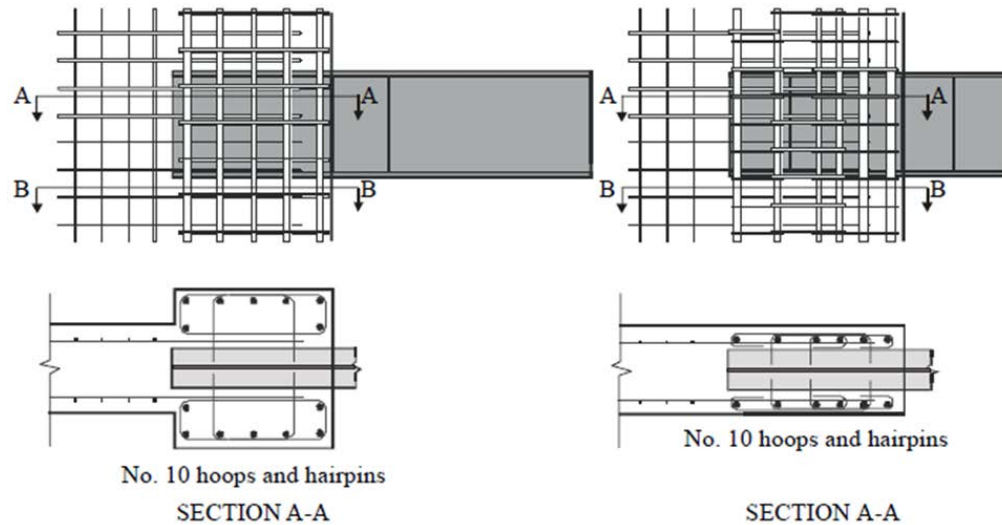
Composite coupling beams layout (Harries et al., 1998)
